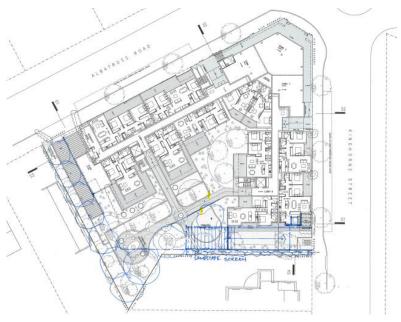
Applicant's submitted concept plan, demonstrating that access via Kinghorne Street is capable of being achieved.
